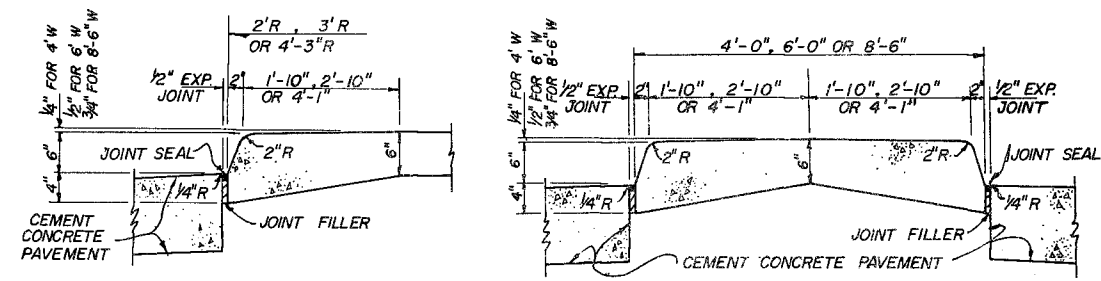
DETAILS OF TYPE II CONCRETE TRAFFIC SEPARATOR
